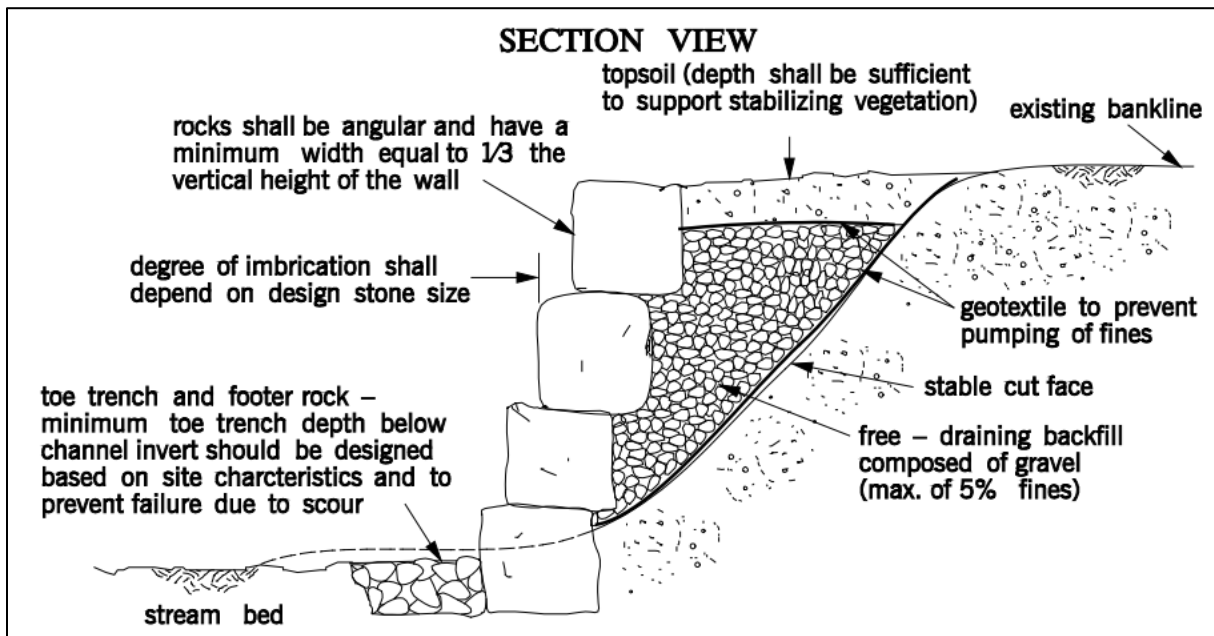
Design detail for an imbricated rock wall (MDE, 2000).
